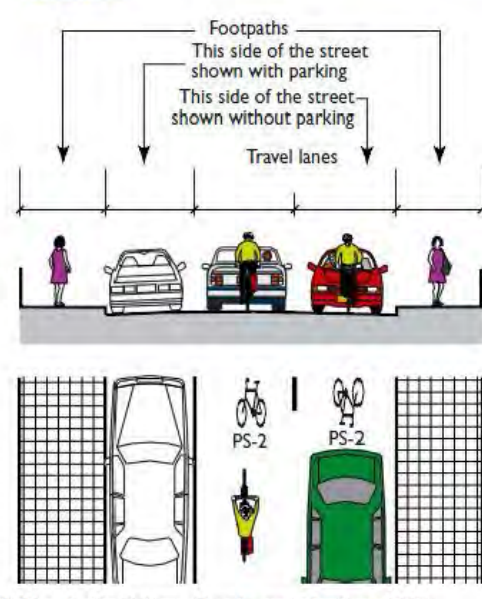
Typical Plan and Cross-Section for On-Road Bicycle Paths
